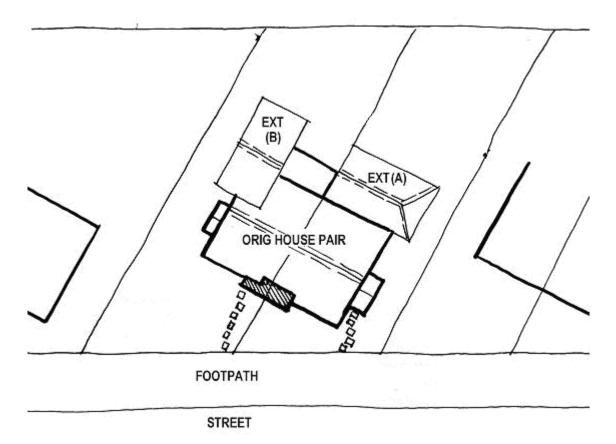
Plan view of extensions at the rear of diagonally placed dwelling pairs.
